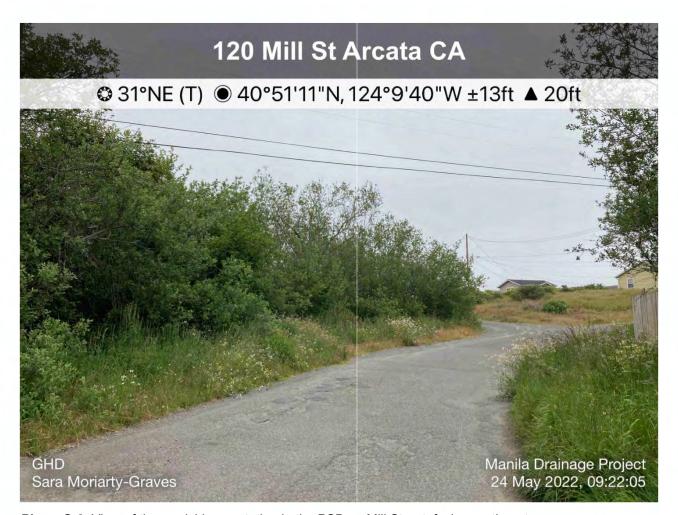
View of the roadside vegetation in the PSB on Mill Street, facing northeast.
